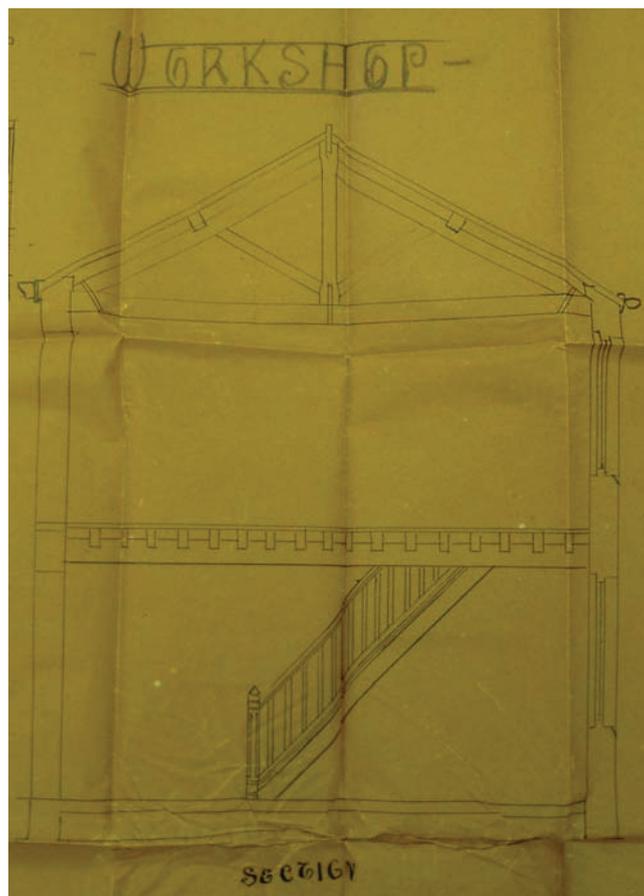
A cross-section through the workshop built for Deason's coachworks in 1878 (CRO(B) BSUD/U/BIPlans/269 1878)
